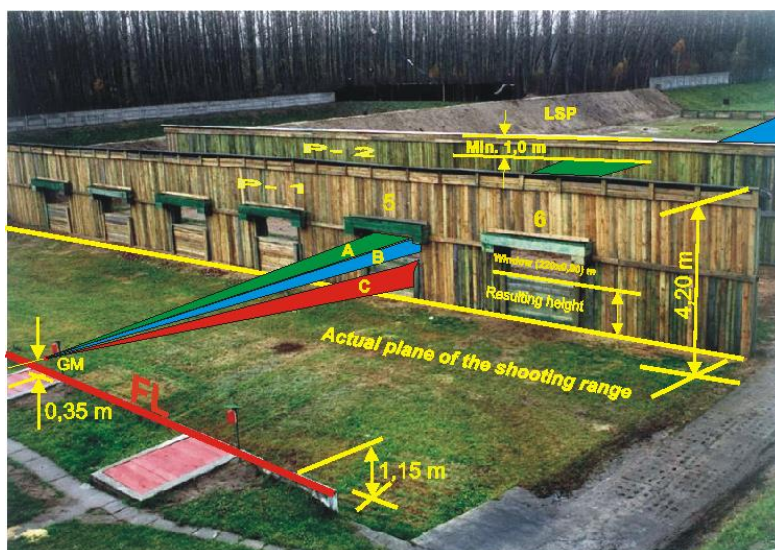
Linear and angular relations and plane system in the 1st part of the shooting zone: LSP – left side protection, A – top shooting plane of the shooting range, B – top shooting plane of the shooting range, C – bottom shooting plane for screen P-2, GM – gun muzzle, FL – firing line, P-1 and P-2 – screens one and two
